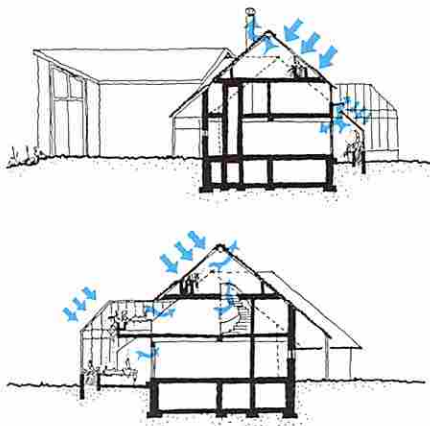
North-south and south-north cross sections of Phase 2 Building Design I
